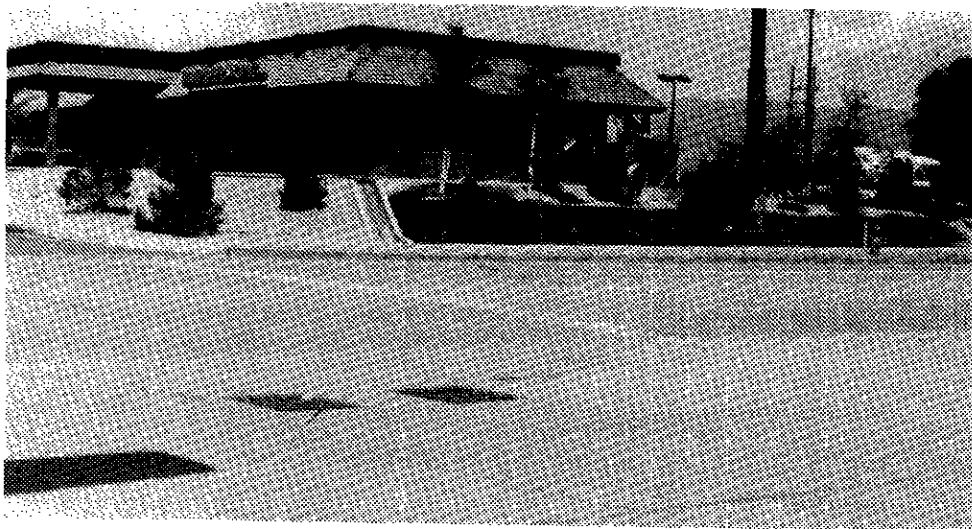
Fill elevated. Fountain Creek floodplain, Colorado Springs, CO.
